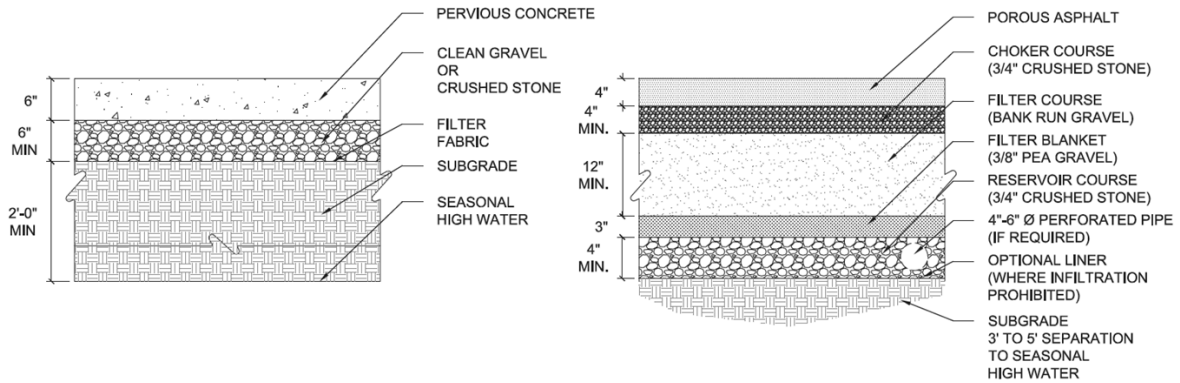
Permeable Pavement of Porous Concrete and Porous Asphalt (CRWA, 2008)
